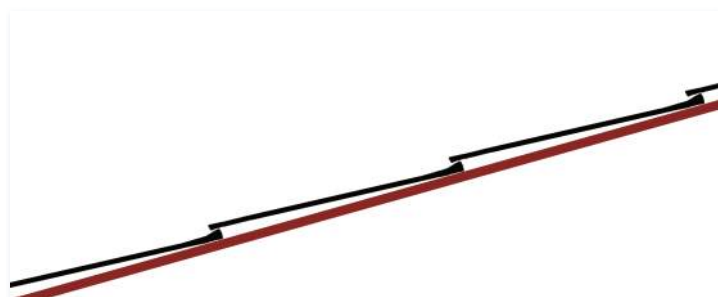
Model cross-section of a roof covering using the roof tile Athens, Kerameikos Z 638
